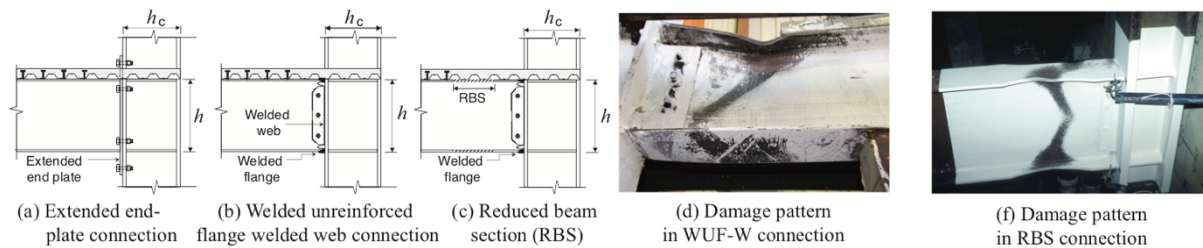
Typical full strength beam-to-column connection typologies and their damage patterns (images “a” to “c” adopted from El Jisr et al. 2019; image “d” adopted from Lignos et al. 2014; image “f” adopted from FEMA 2000)
